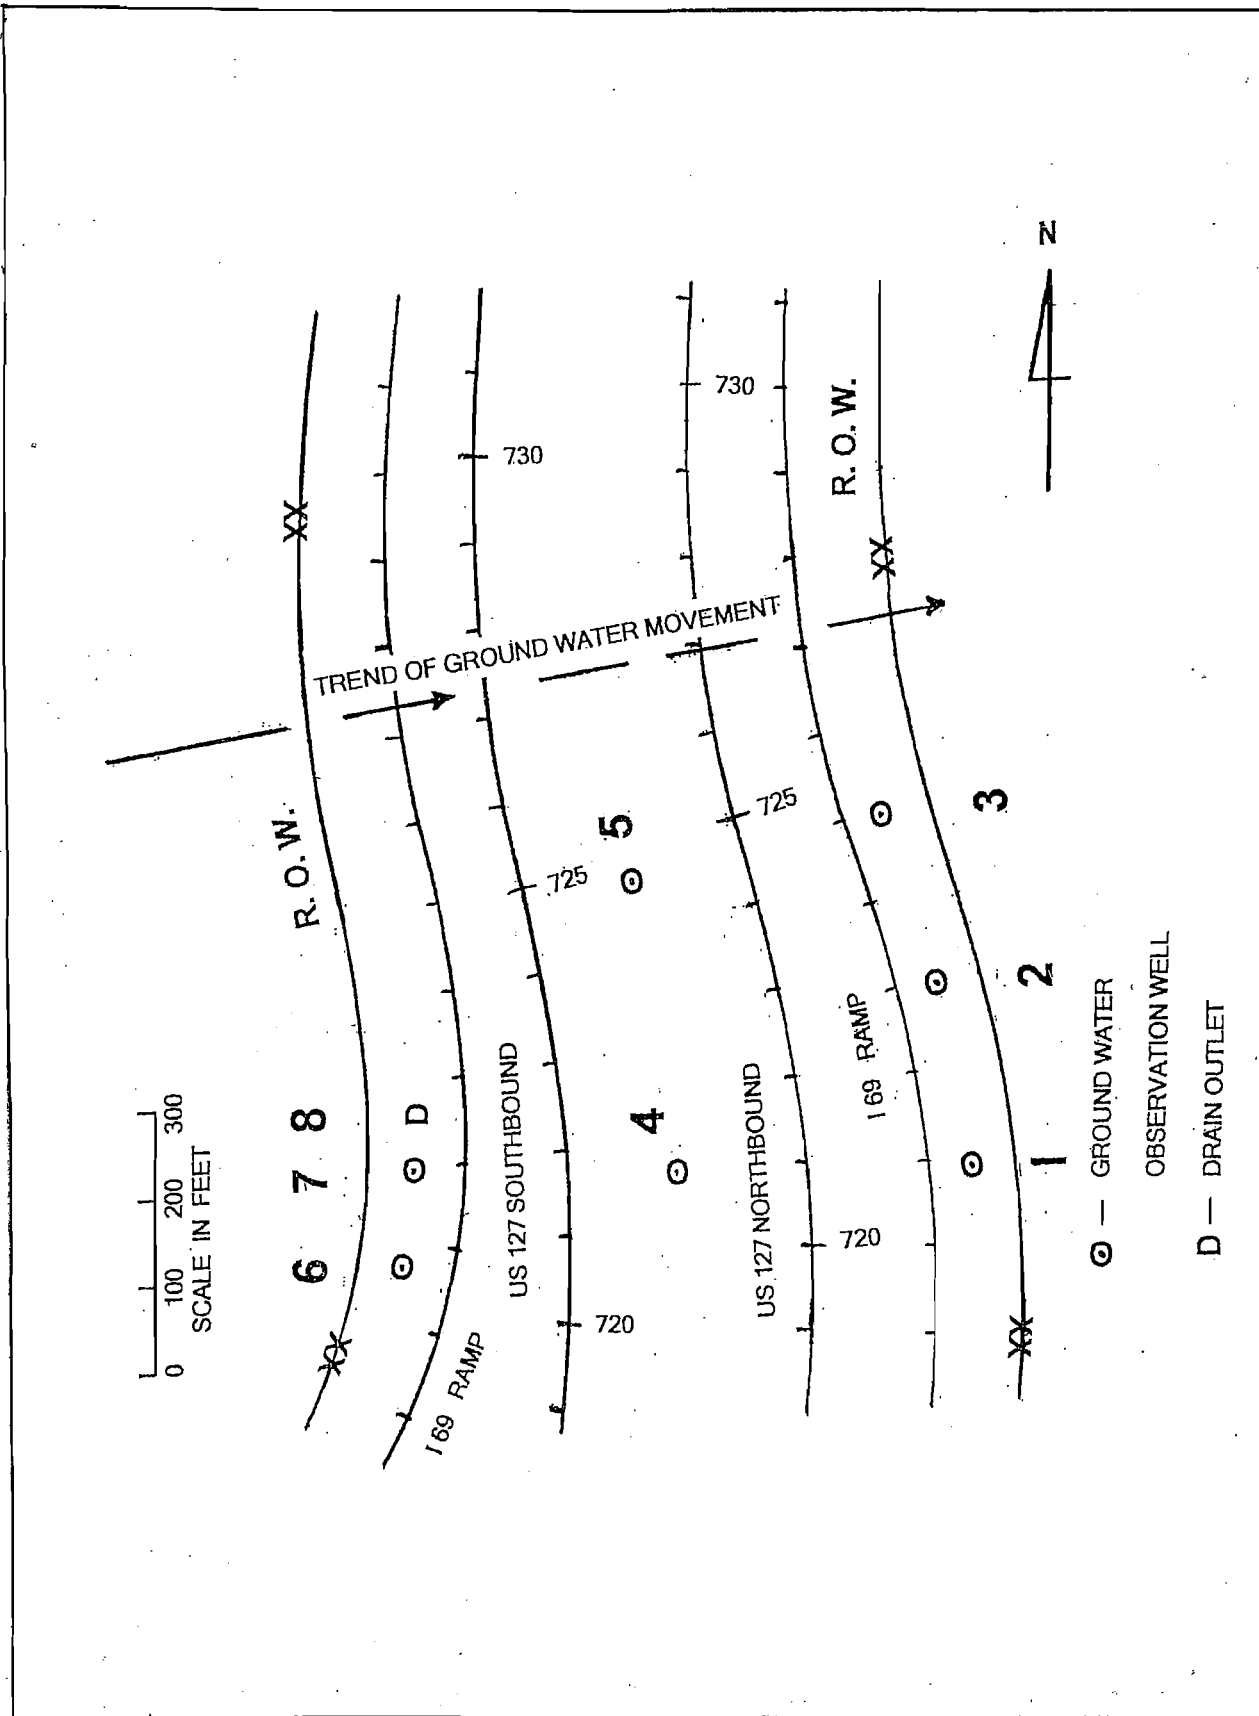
US 127 well locations, southeast of Dewitt. Roadway opened to traffic in 1998.
